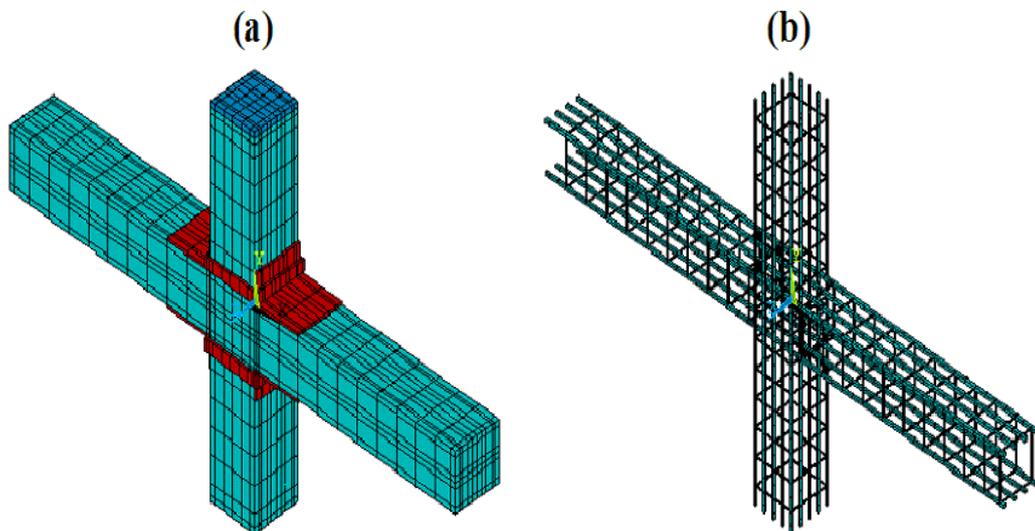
The FE model of a typical internal joint (a) concrete and FRP elements and (b) steel reinforcement.
